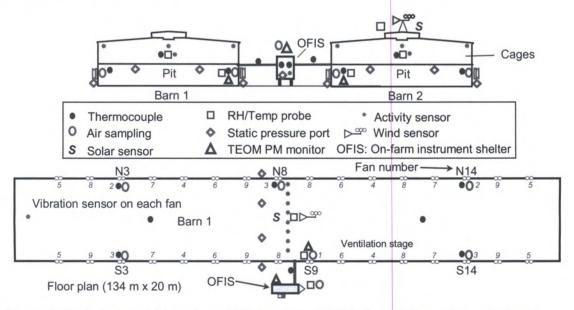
End view and floor plan of HR barns and OFIS. Barn 2 floor plan not shown.
